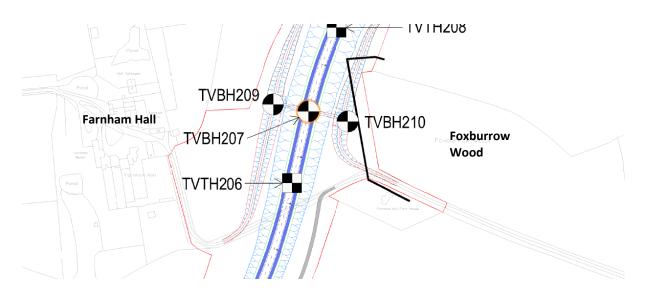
Exploratory hole plan for cutting adjacent to Foxburrow Wood and Farnham Hall
